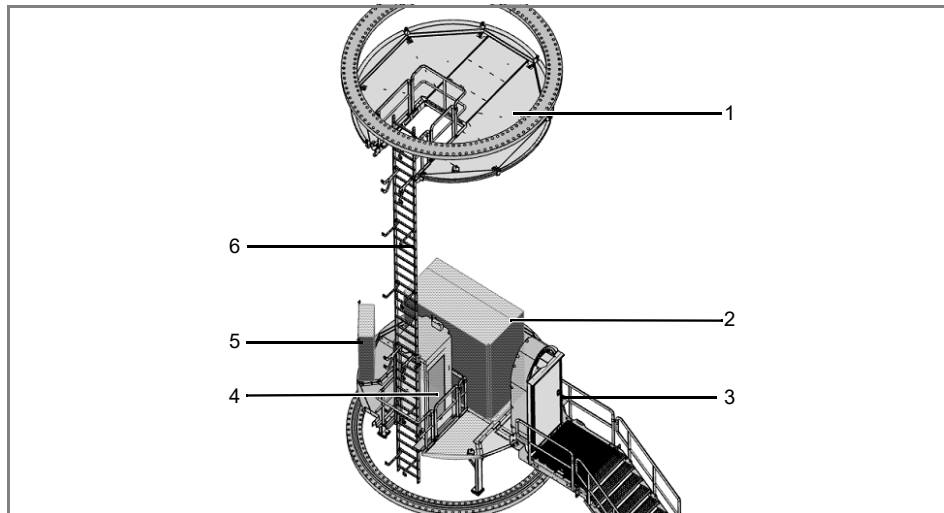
Overview of installations in the bottom section of the steel tube tower
